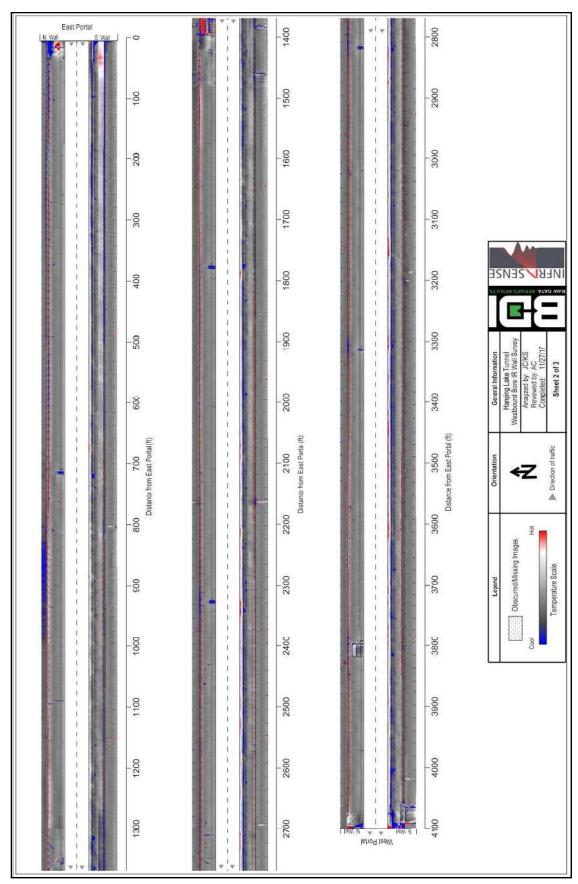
Infrared wall survey of Hanging Lake westbound bore
